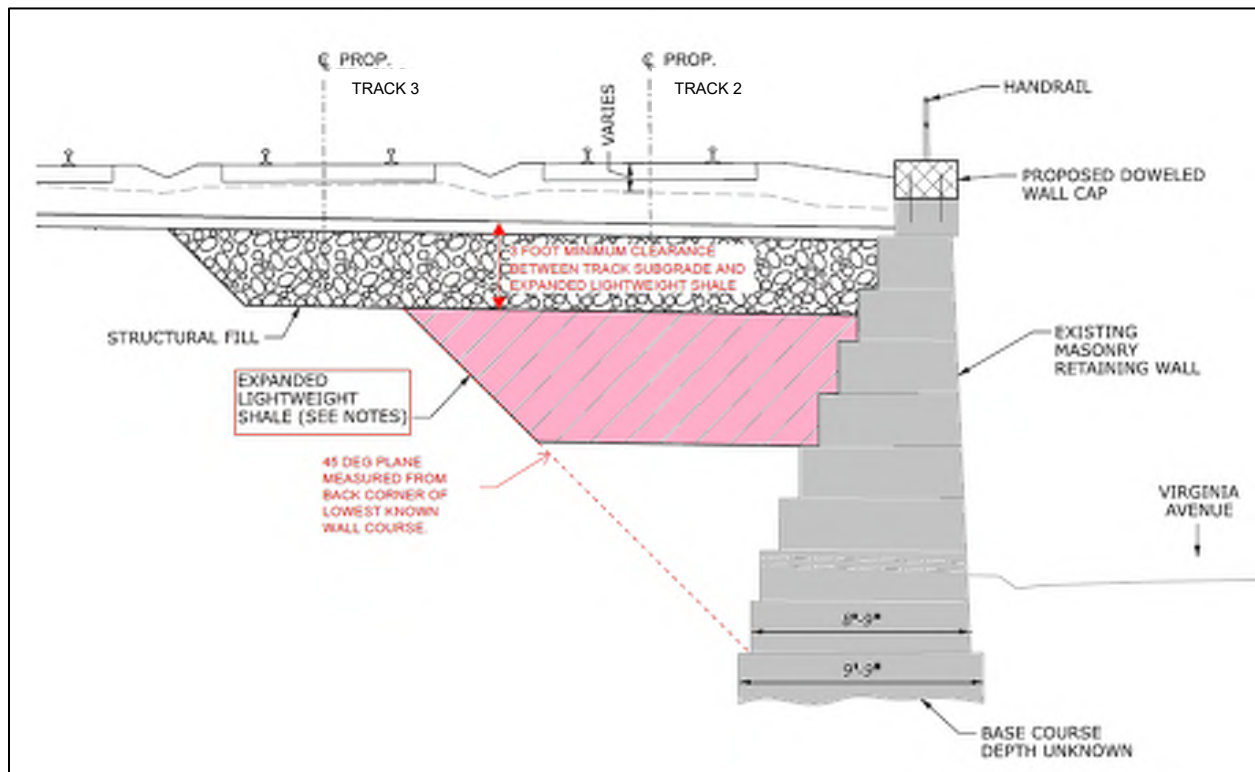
Figure A: Virginia Ave SW Retaining Wall, Excavate and Replace with Lightweight Fill
